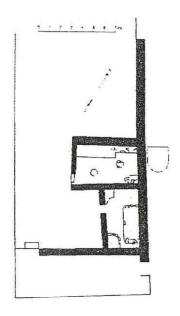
Farmhouse Plan in Alambra. (from E. Gjerstad)
